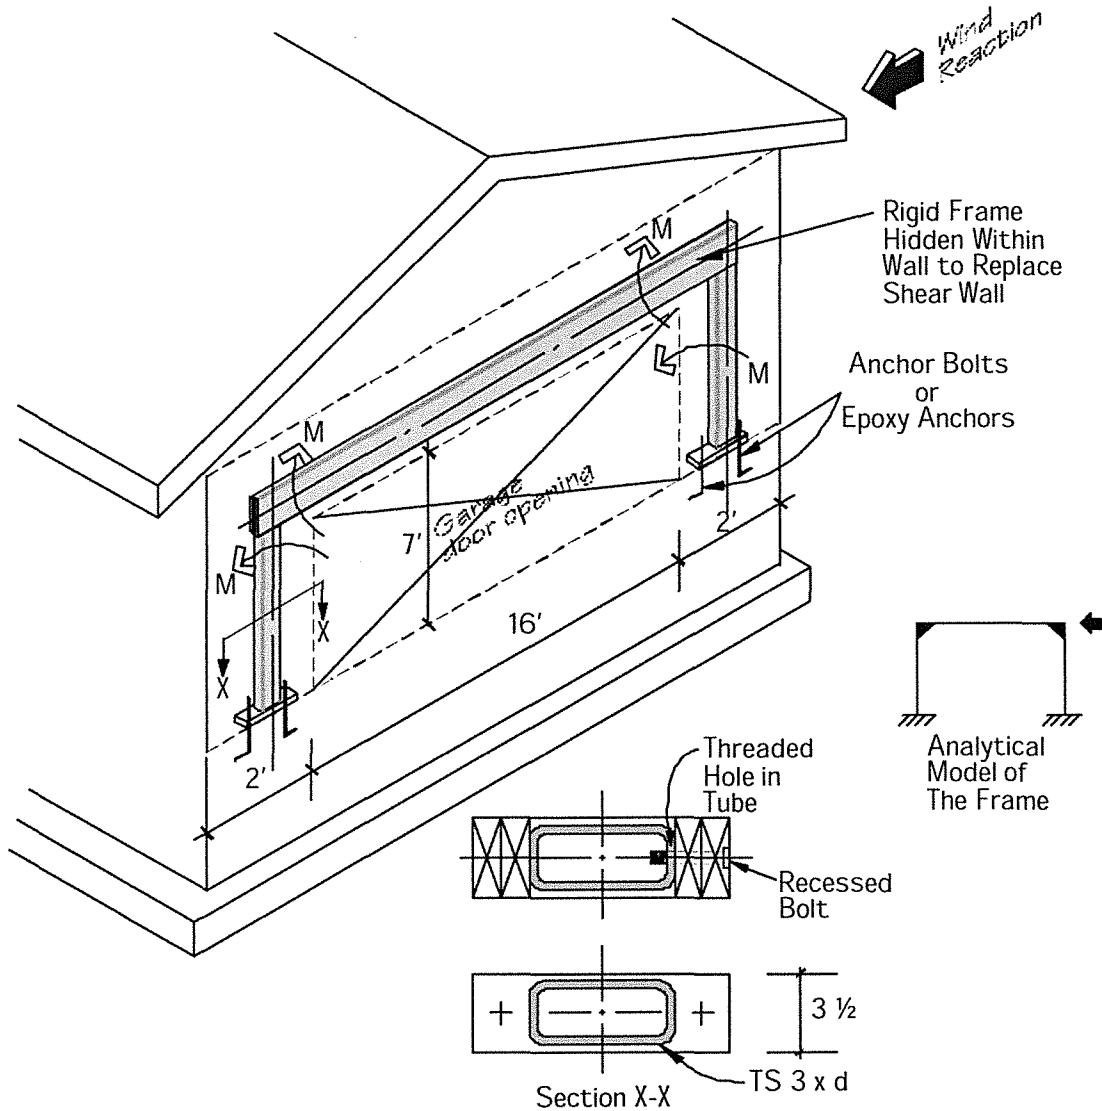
Steel Frame Hidden Within Garage Wall
